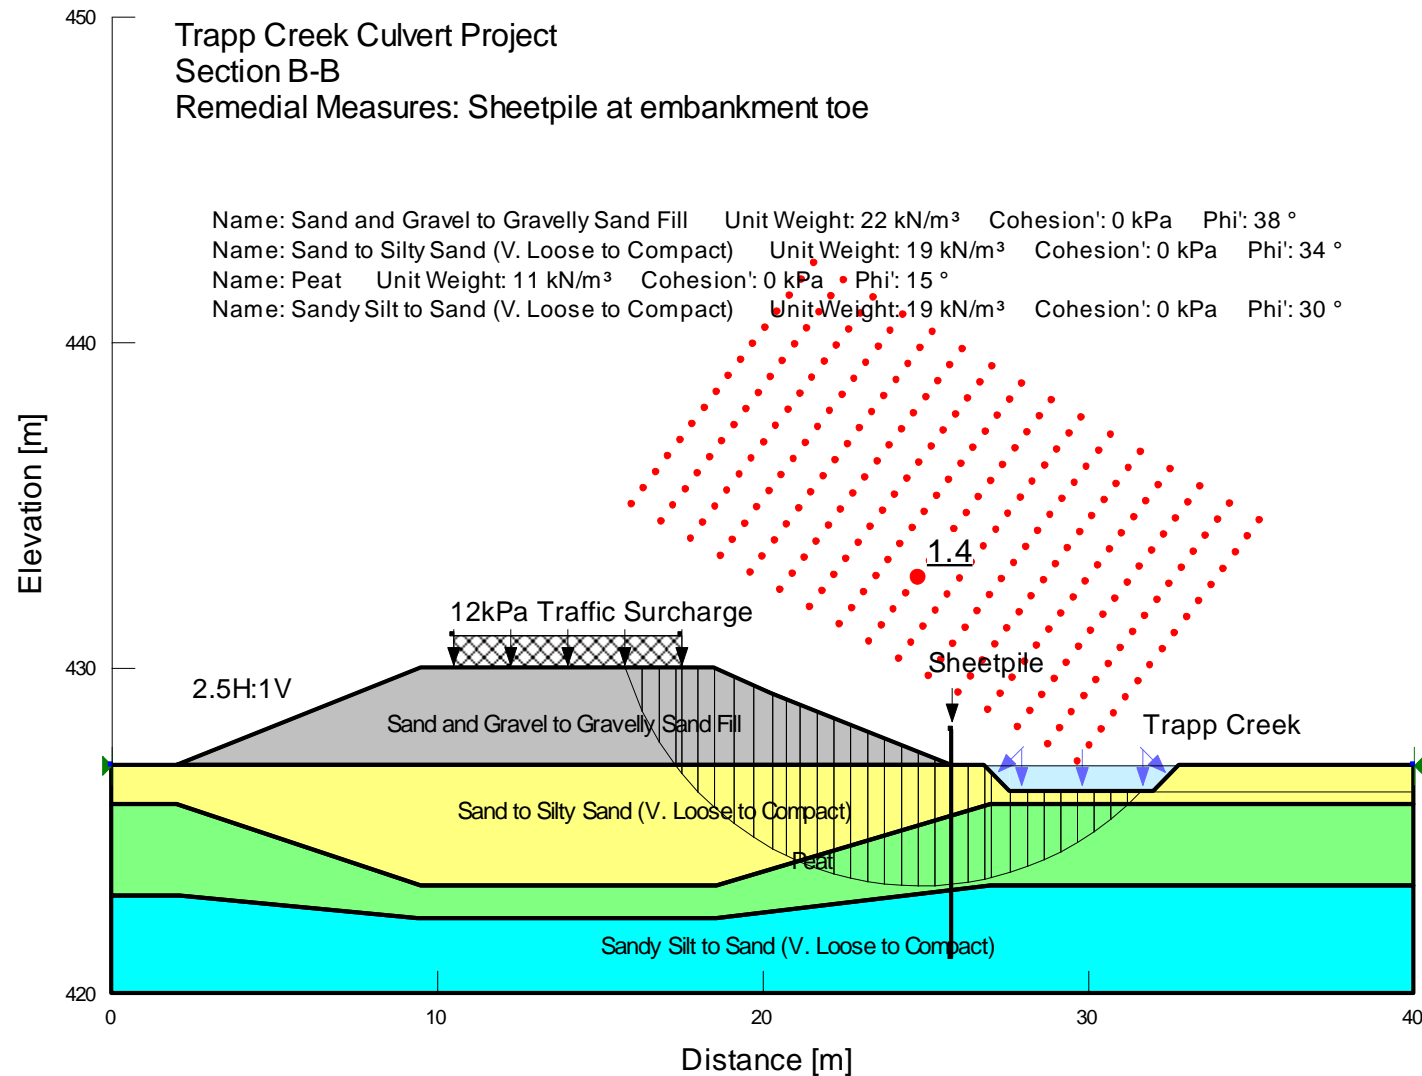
Results of slope stability analyses at Section B-B; Remedial measure – sheetpiles at embankment toe
